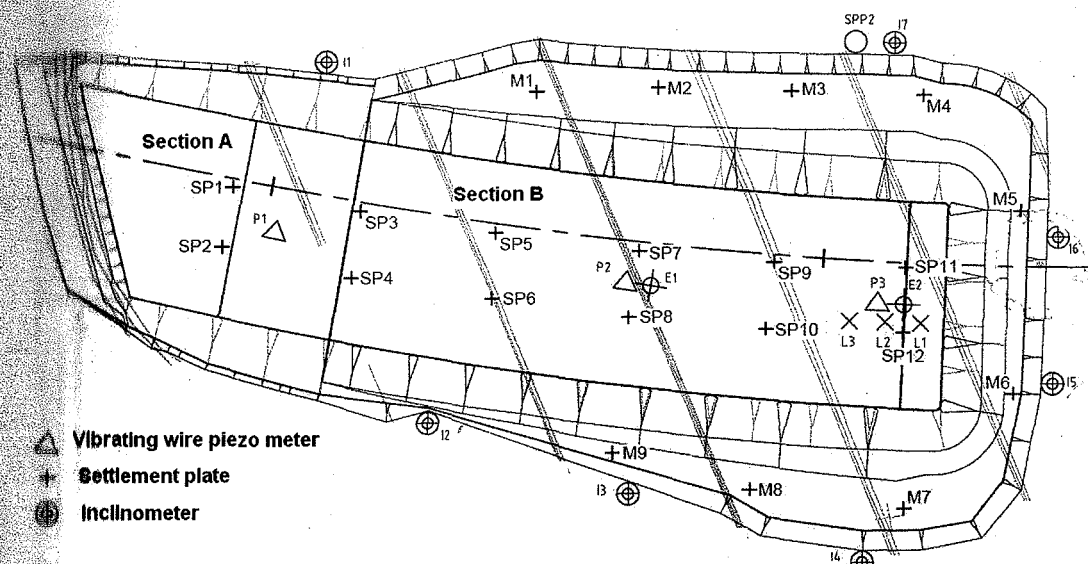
Instrumentation layout for the test embankments at Ballina Bypass (Indraratna *et al.*, 2009).
